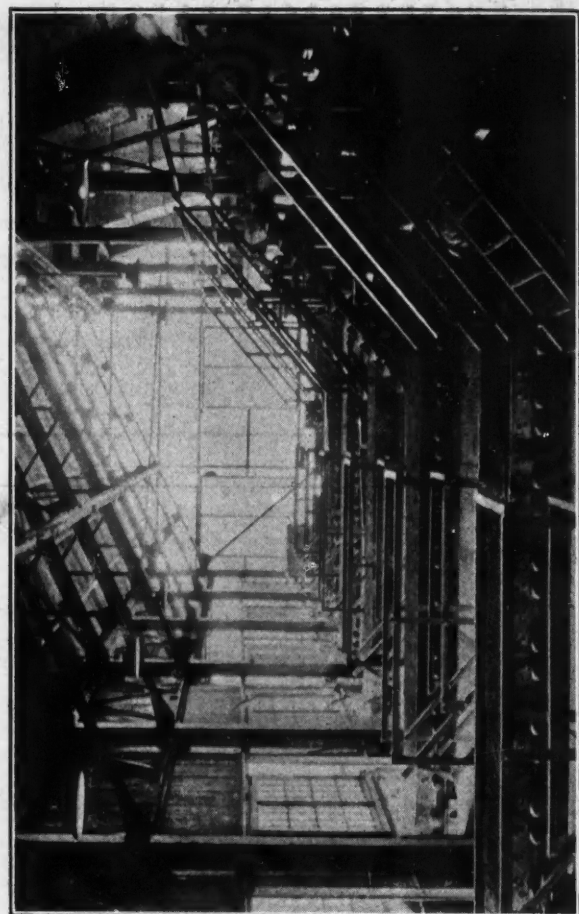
ROASTER BUILDING—OPERATING FLOOR
